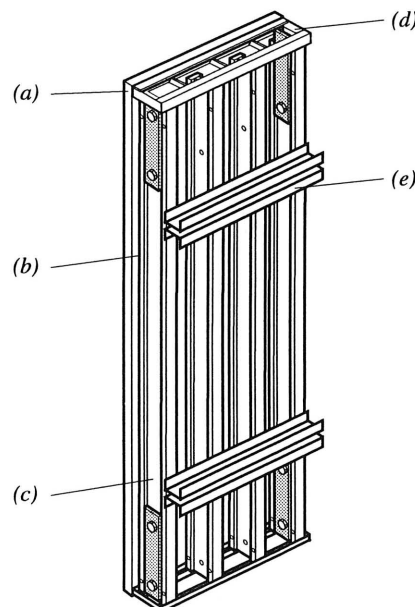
Wall formwork. (a) three-ply formwork sheet, (b) timber girders, (c) connection with connectors, splice plates and fastening bolts, (d) stacking flange, (e) steel waling.
